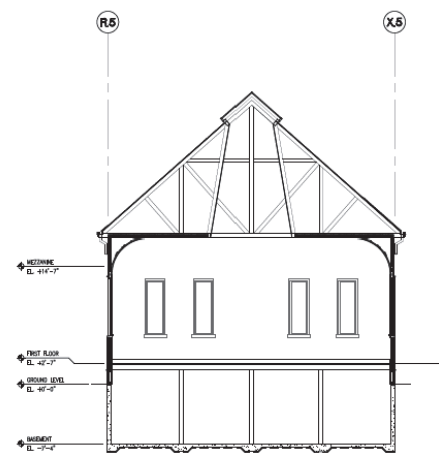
Proposed project, transverse section, looking east at interior of east façade.
